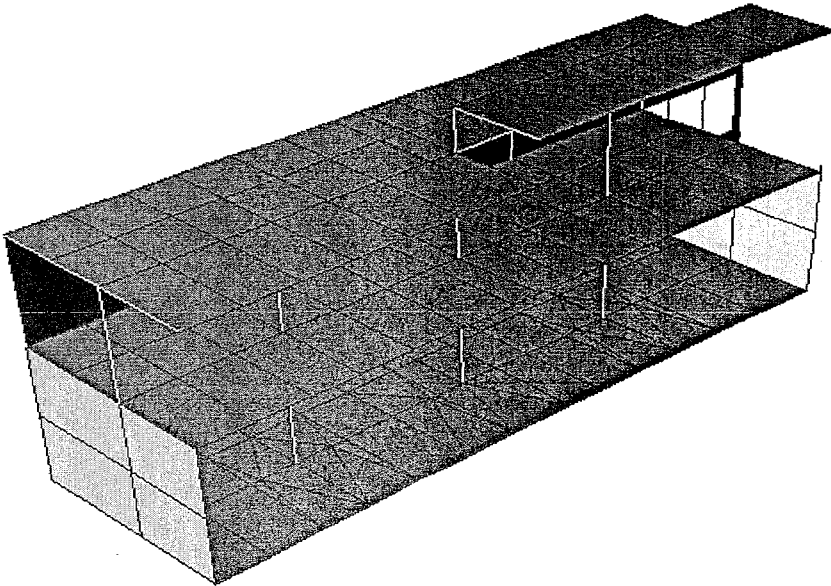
3-D Cross-Section of the Electric Power Transformer Building
